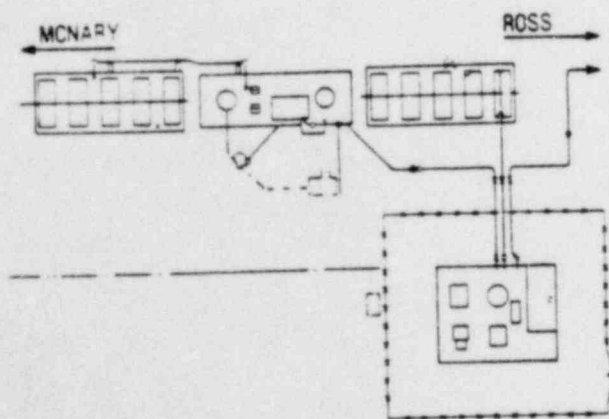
Plan view of installation (C phase) showing existing capacitor bank and new prototype platform (lower right).
